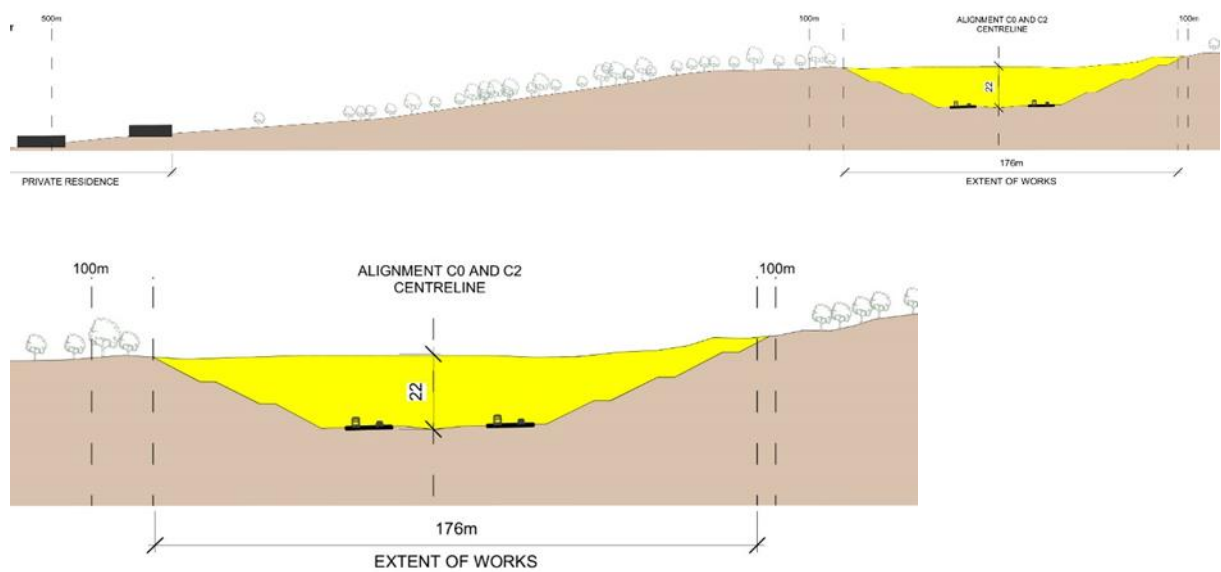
Cross Section 8 – Alignments C0 and C2. (and close-up section)
